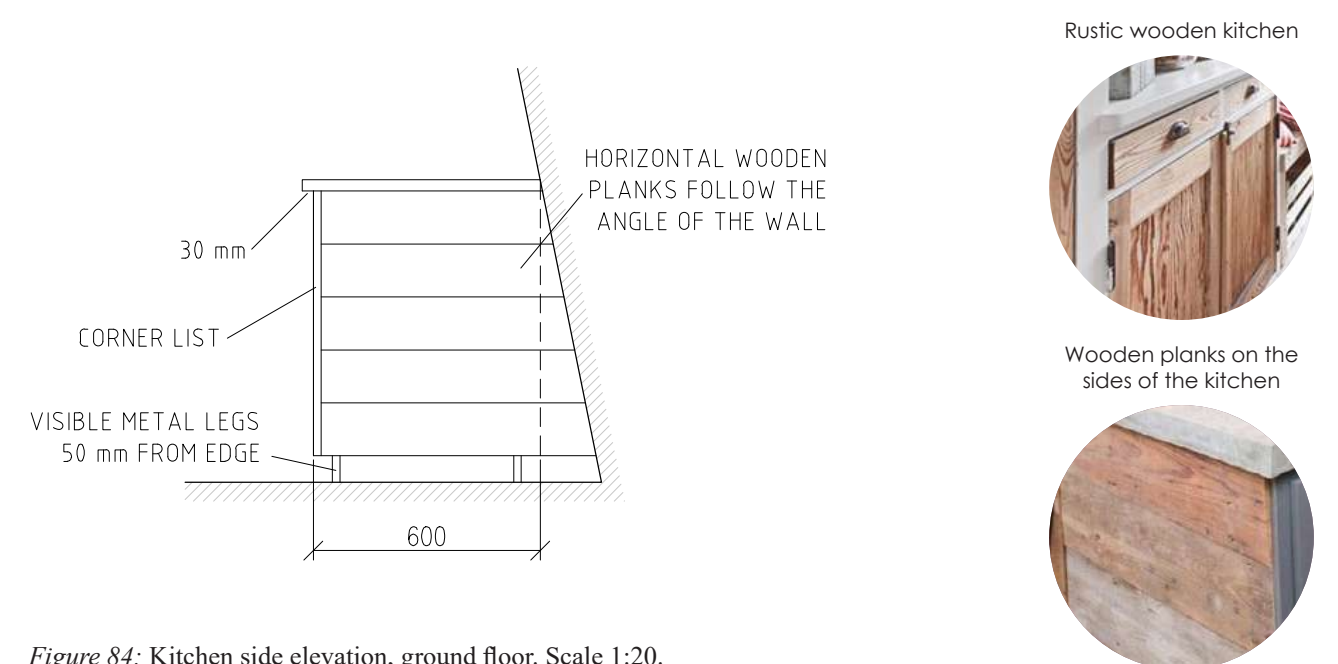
Kitchen side elevation, ground floor. Scale 1:20.
